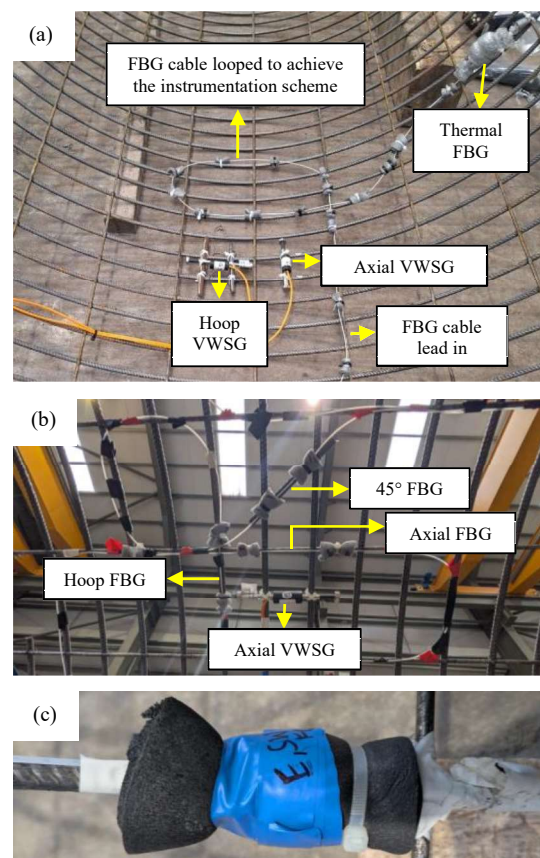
Strain sensor installation: (a) South cardinal point of IP1, (b) north cardinal point of IP2, (c) FBG cable connector taped to the reinforcement bar and encased in foam.
